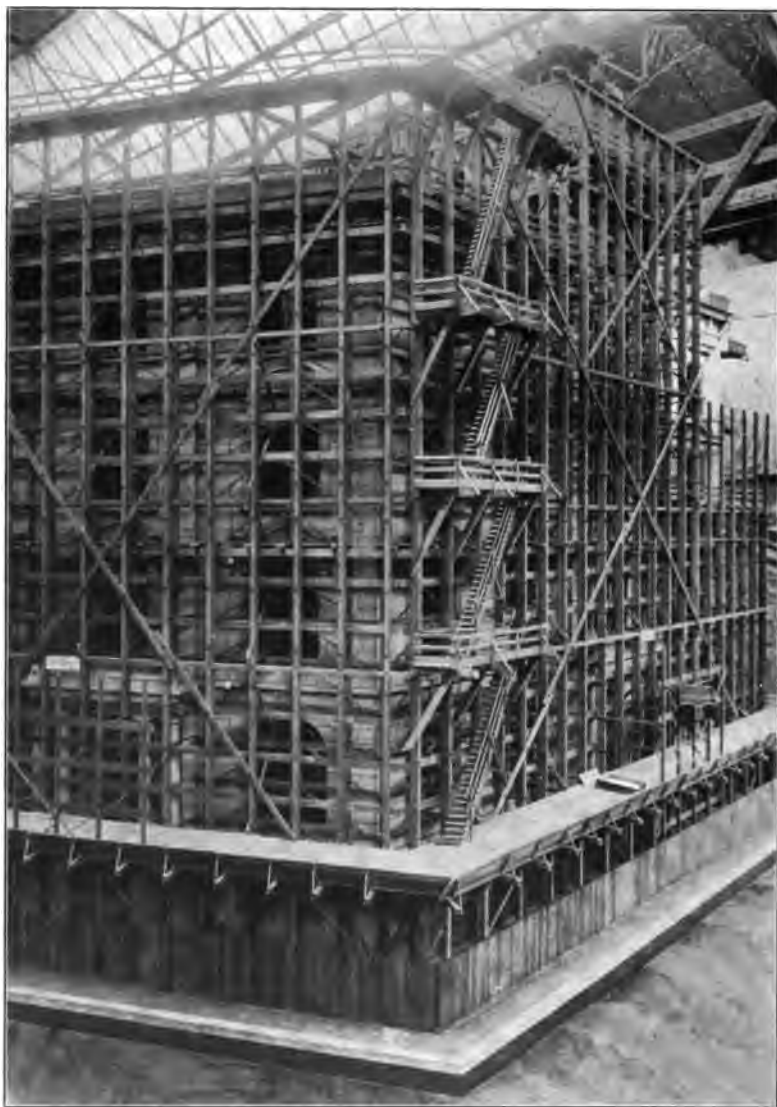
SCAFFOLD STAIRWAYS WITH RAILED PLATFORM LANDINGS.
